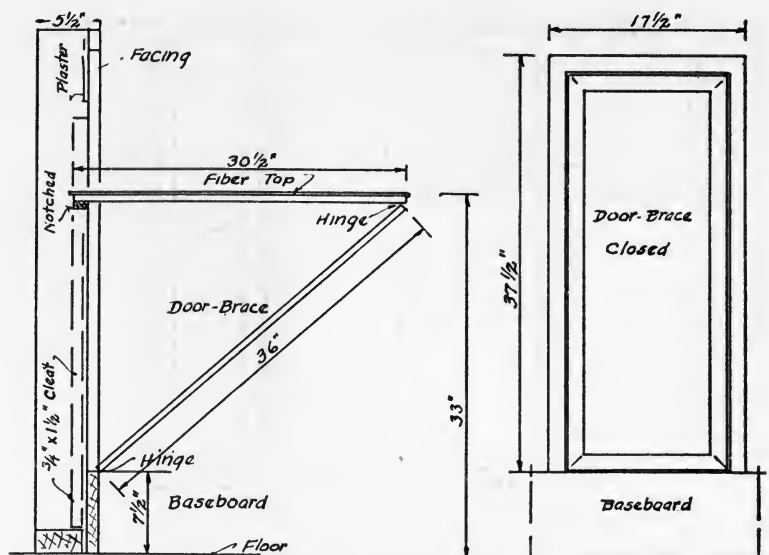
Drop shelf fitted into the wall; may be let down to give temporary or extra work surface space. Made also from the standard mouldings and panels. The shelf drops in behind the door when not in use.
